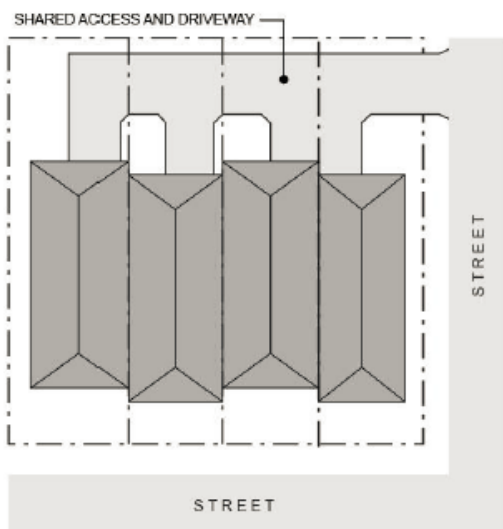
(B)(2)(b): Townhouse Driveway Approach Limits
